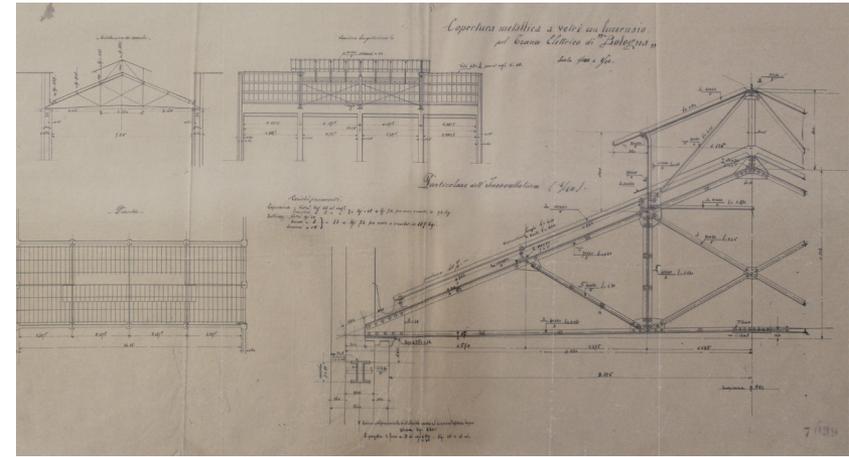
Unknown author, Electric Tram, Bologna – Truss roof with skylight, Archivio Barbieri, Courtesy of the property owner.
